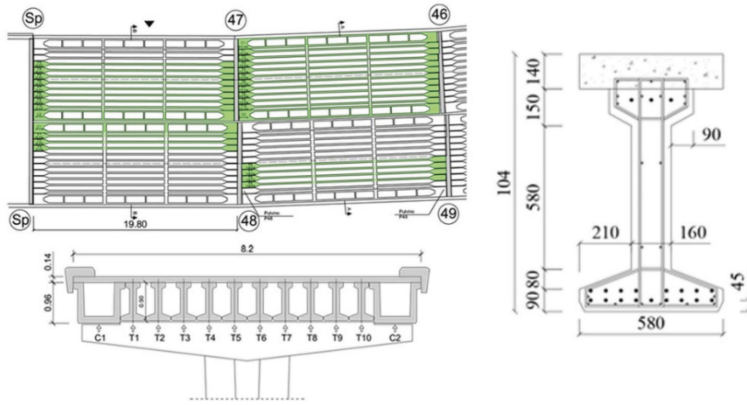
Drawing of the first four decks of the southern part of the viaduct. In green, the beams collected to be tested. On left, the I-shaped beam cross section (measures in mm).
